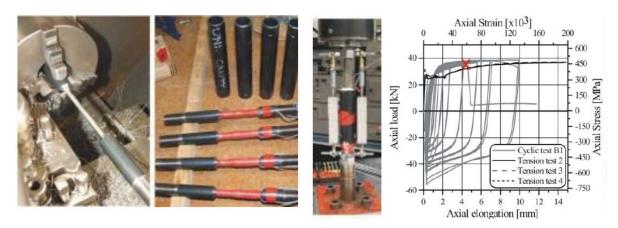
Manufacturing process and testing of "Plug & Play" dissipaters [19]
